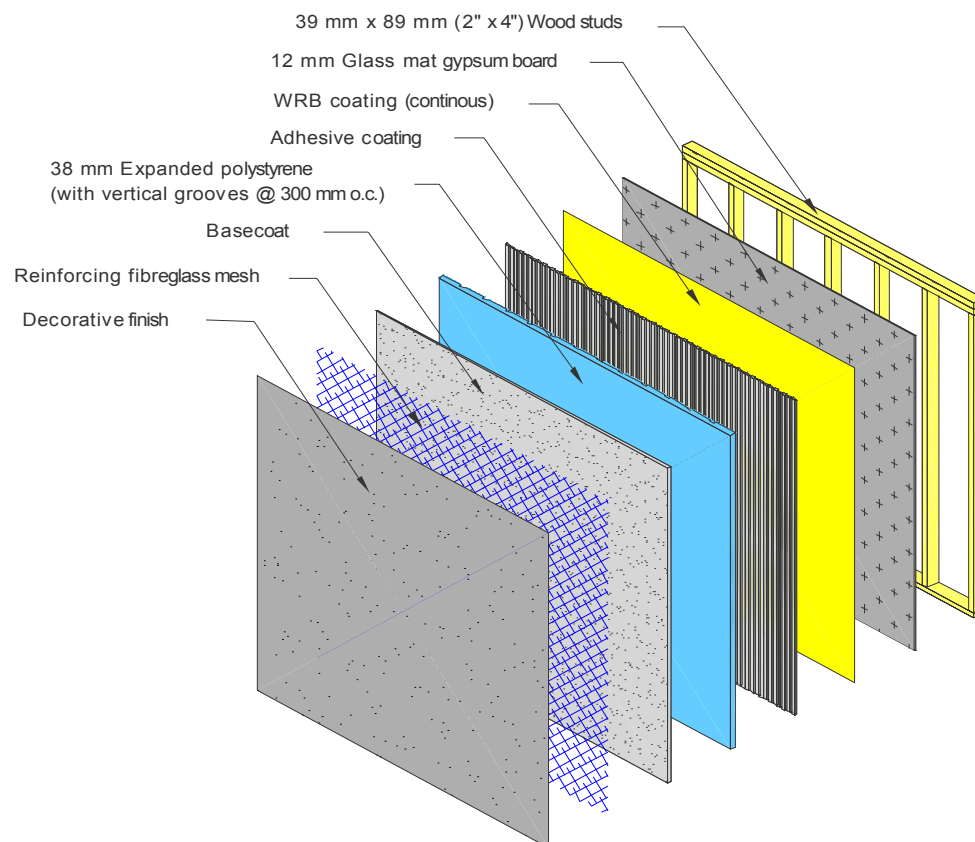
EIFS-clad wall (specimen No. 9) with a WRB and EPS foam with vertical grooves for drainage
